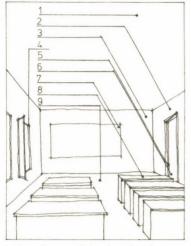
Functionally essential colour-bearing surfaces in a classroom: 1) ceiling; 2) wall; 3) wall; 4) window casing and leaf; 5) door casing; 6) door leaf; 7) blackboard; 8) benches; 9) floor
